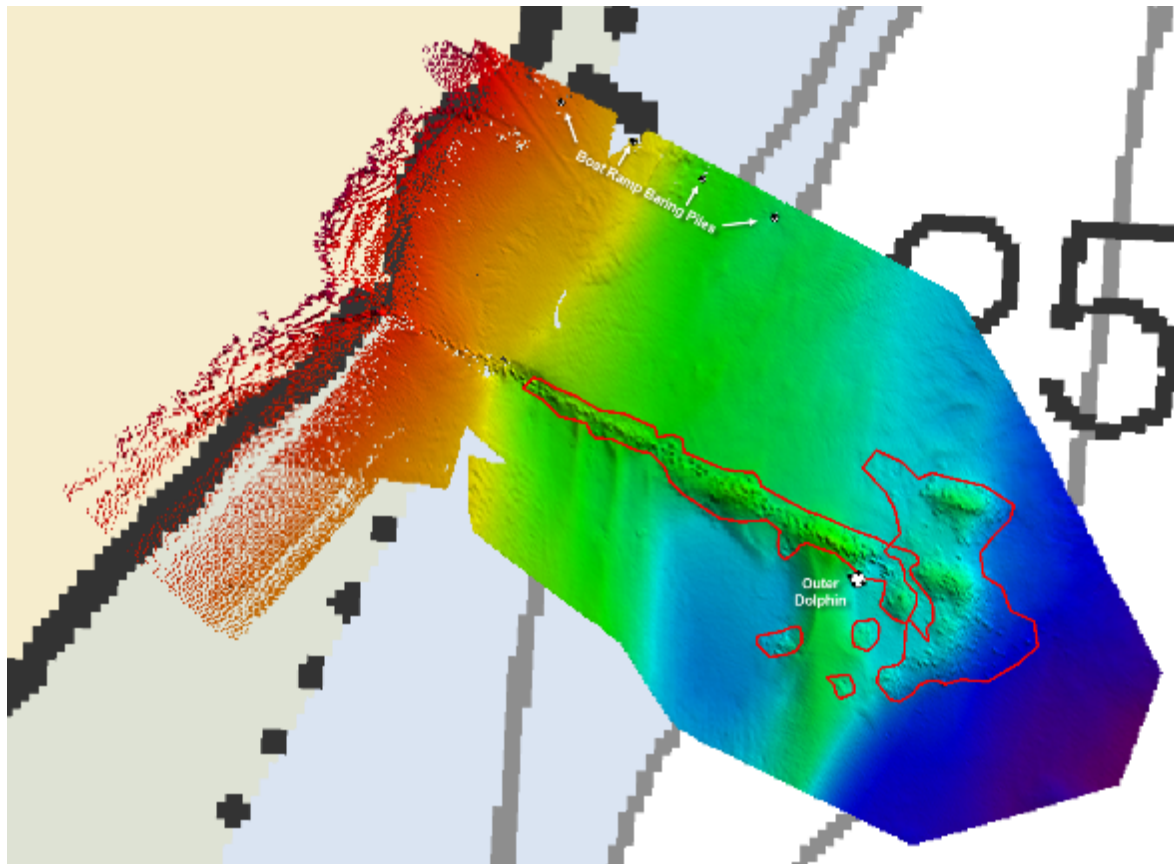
Pile Dike 6.6 plan view hillshade map depicting the extent of exposed armor rock (outlined in red), outer dolphin and boat ramp piles.
